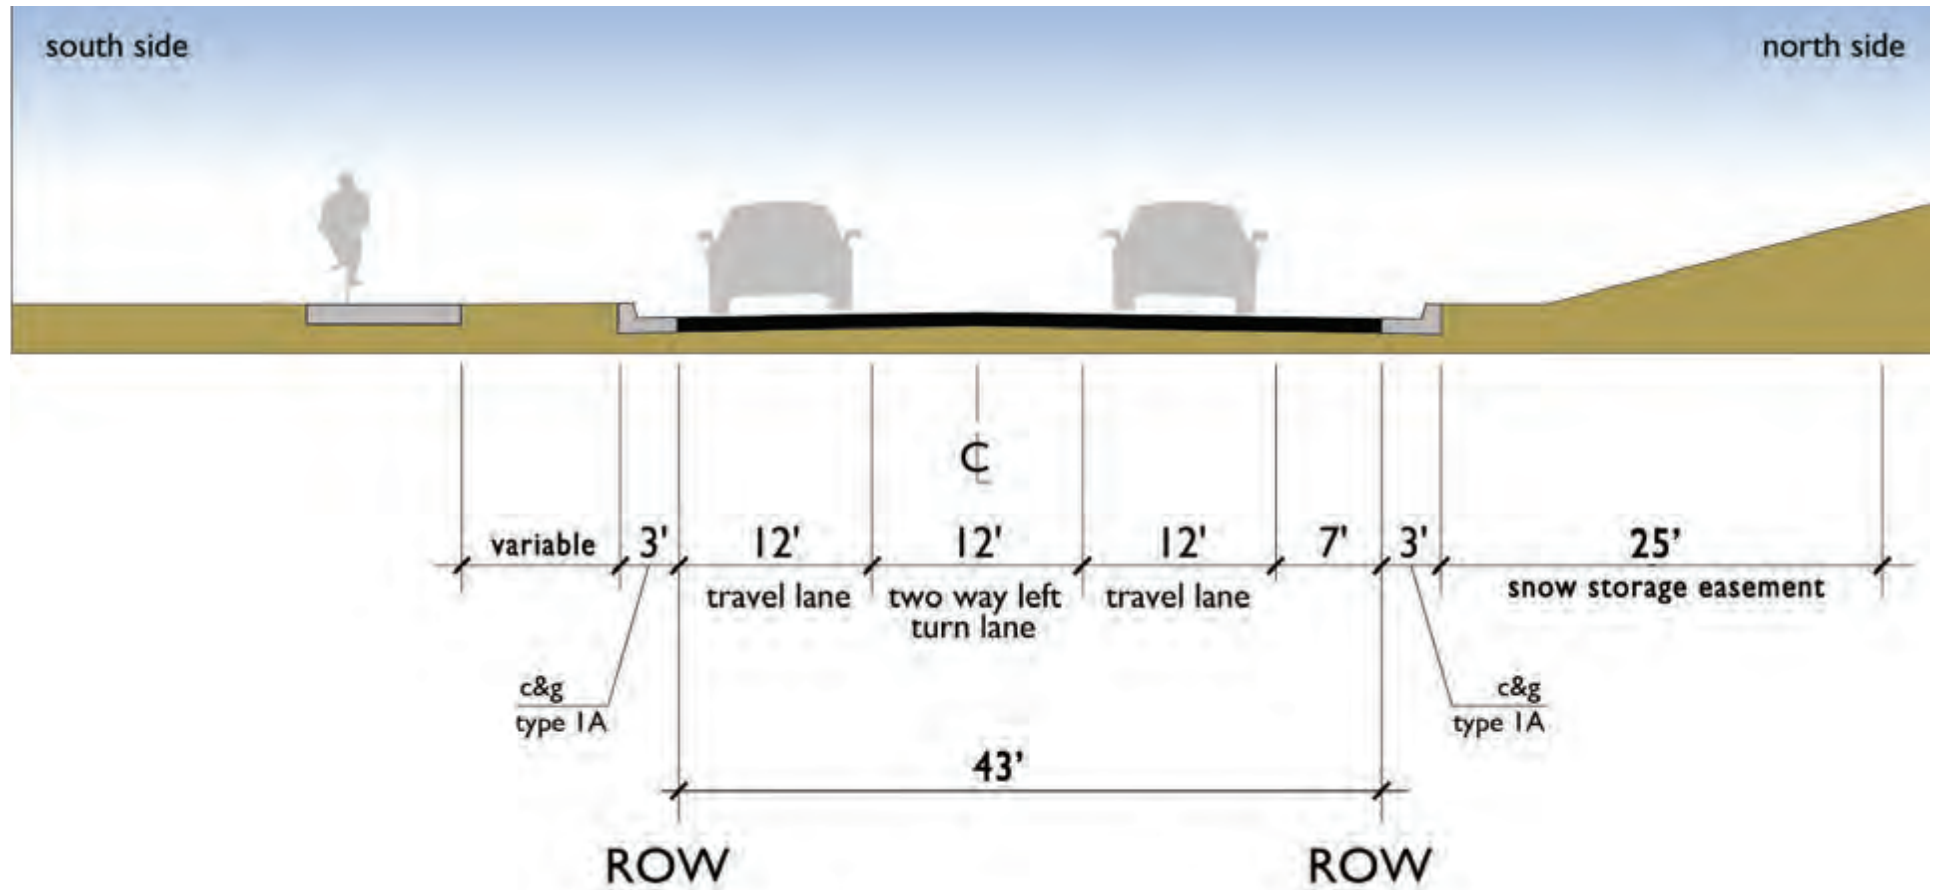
SECTION B: SQUAW VALLEY ROAD
